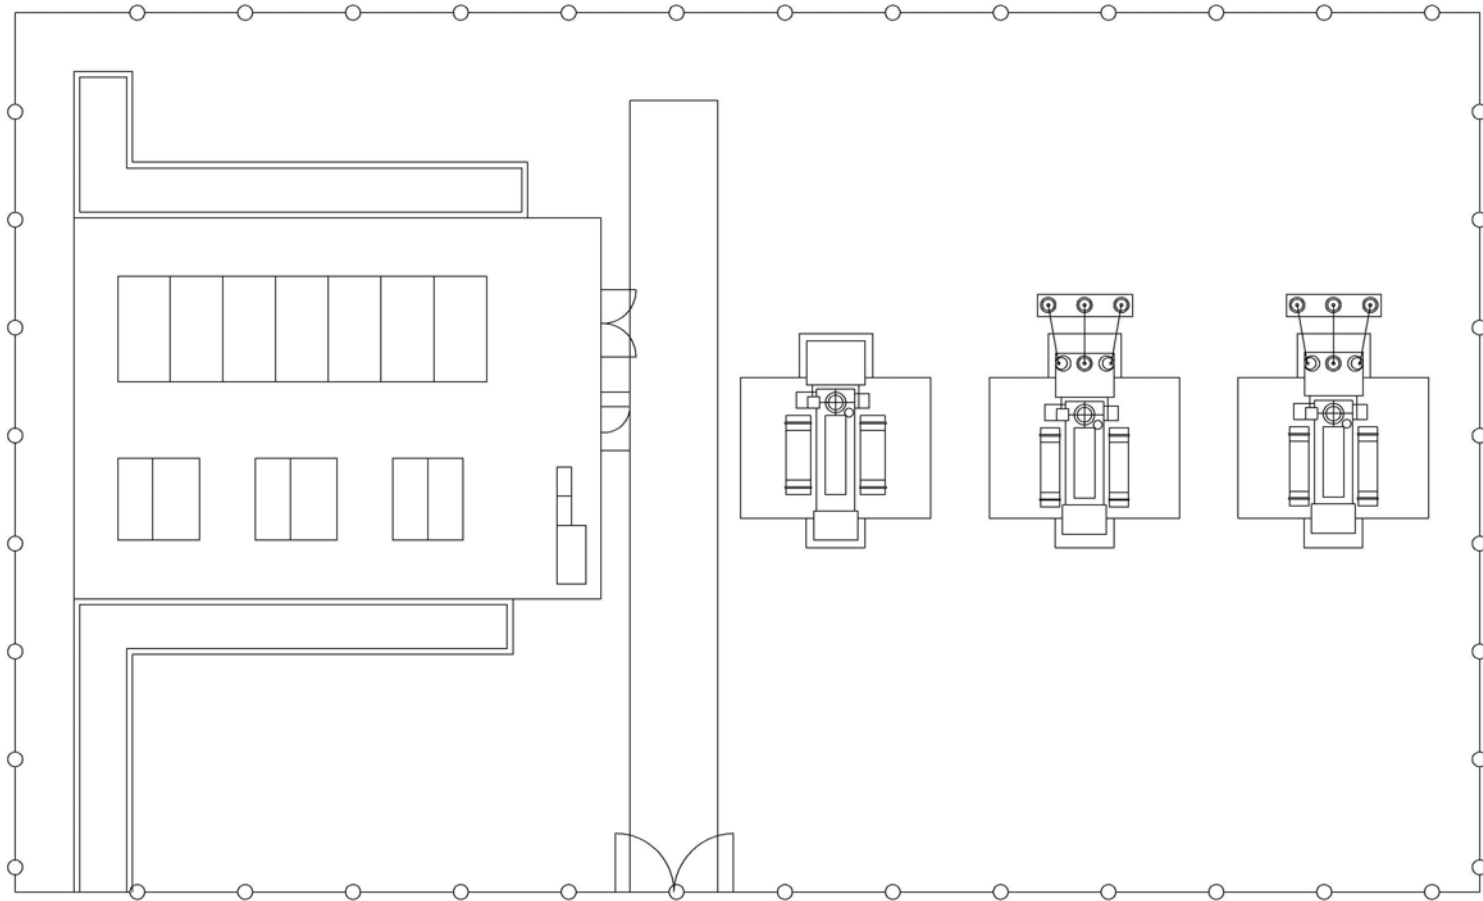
New Aimeliik Substation Equipment Layout Plan
